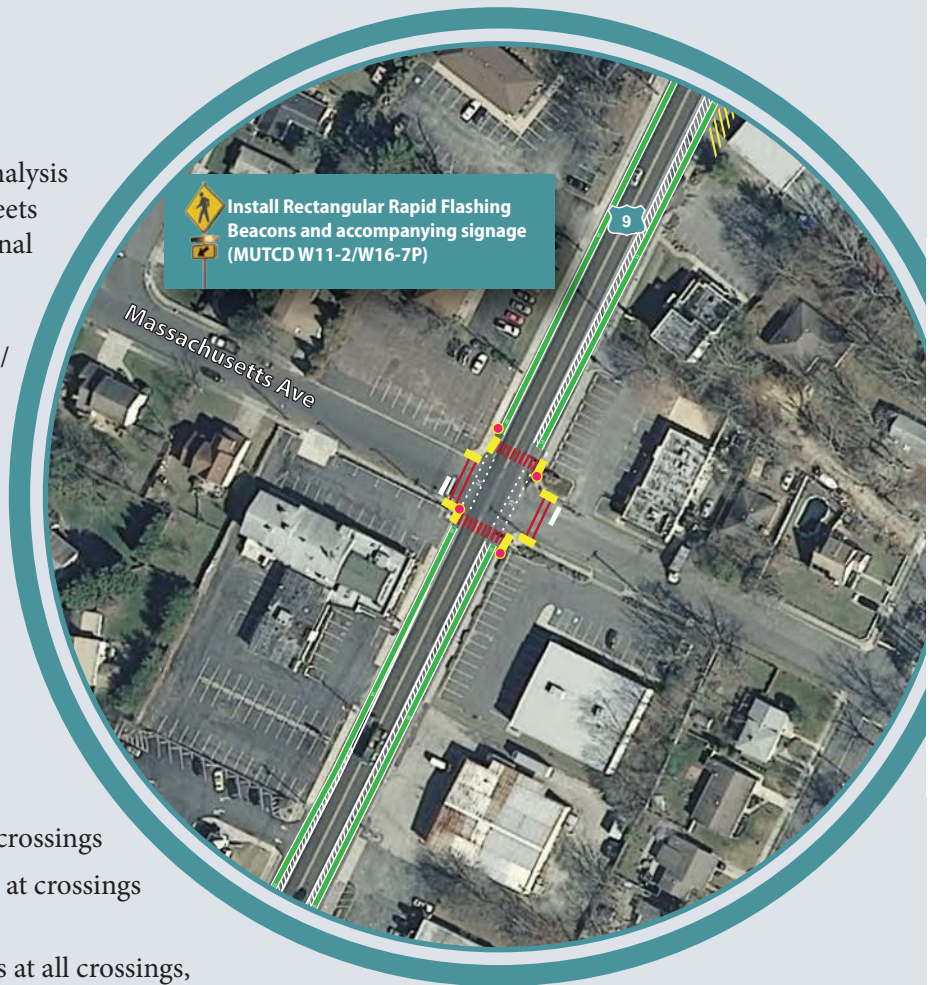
| U.S. Route 9 (New Road) at Massachusetts Avenue
